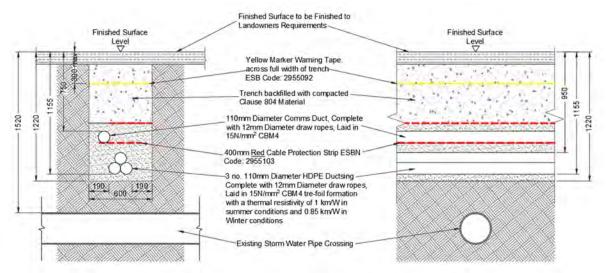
Typical Piped Culver Crossing - Ducting over culvert crossing details.
